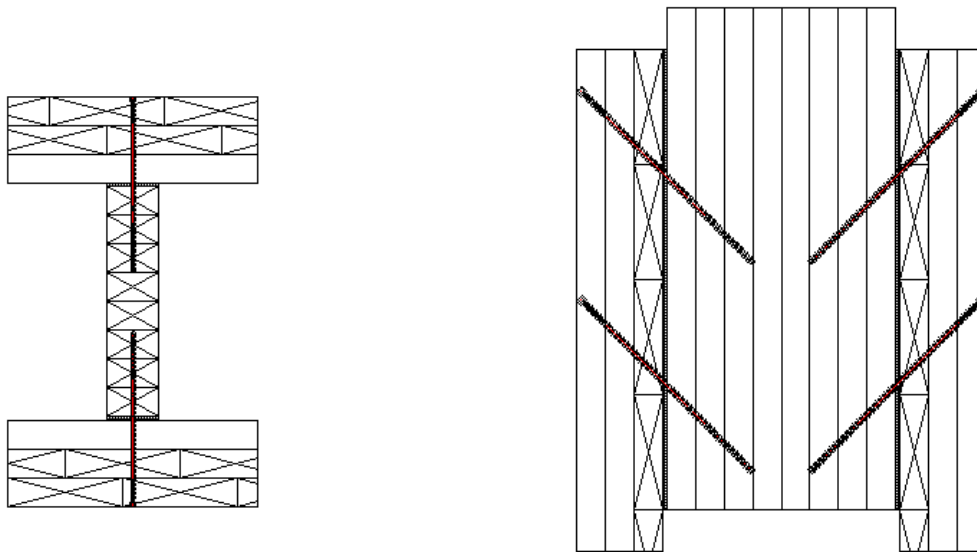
Test #13 – SFS Intec Screws at 45 Degrees Through Rubber Membrane
